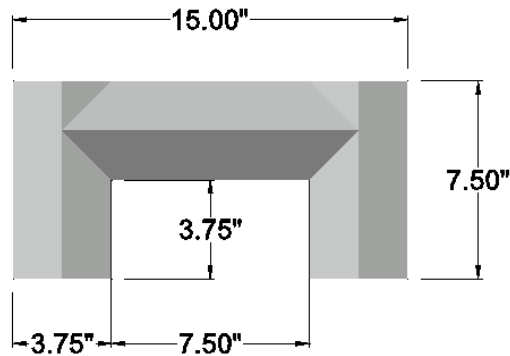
Model $C1_{gable\&flat}$ dimensions - top view
